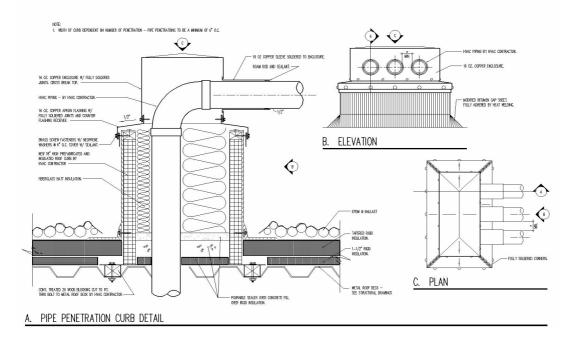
Anticipating future roofing replacement can save considerable future costs. Thus the installation of a counterflashing receiver prevents the need for removal and replacement of the roof top unit.
